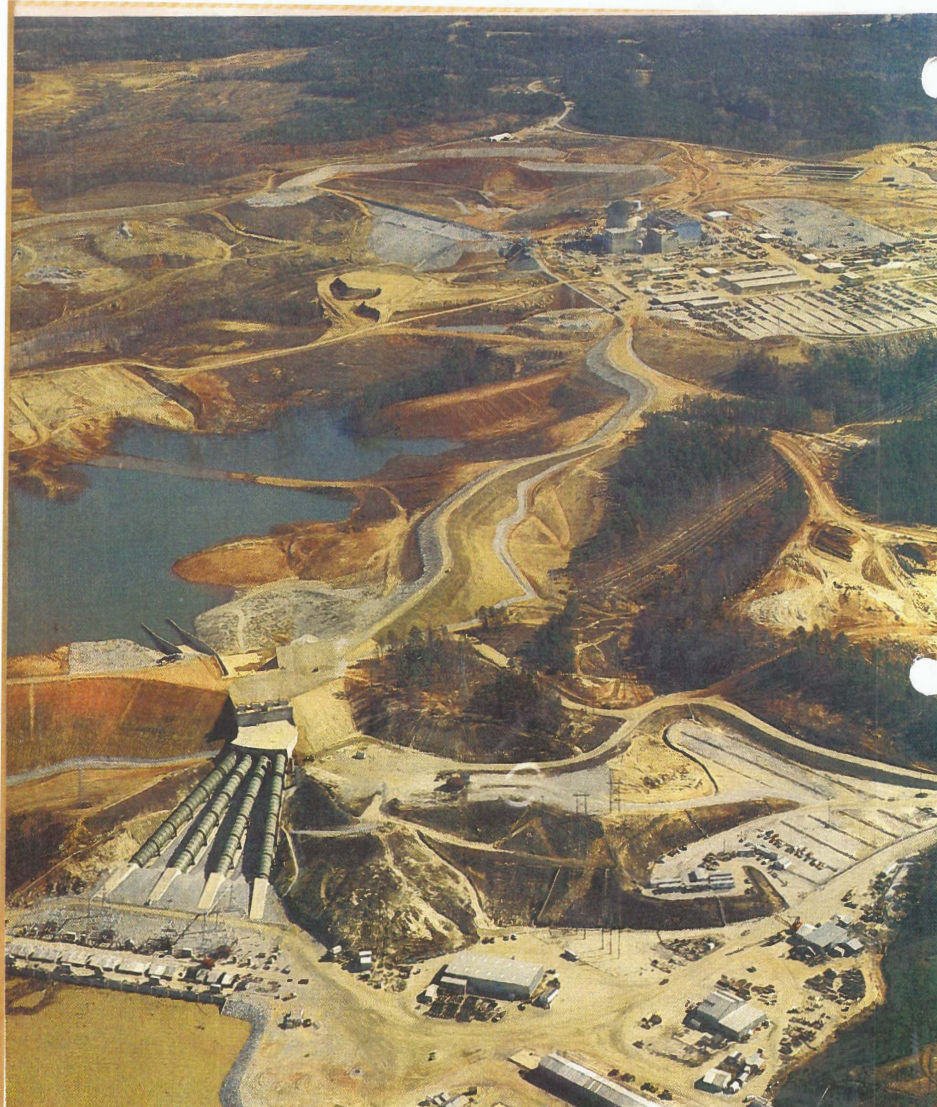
Recent Aerial Photograph of VCSNS Site Showing Structures, Buildings, Monticello Reservoir, Dam and Pumped Storage Facility, Facing West
